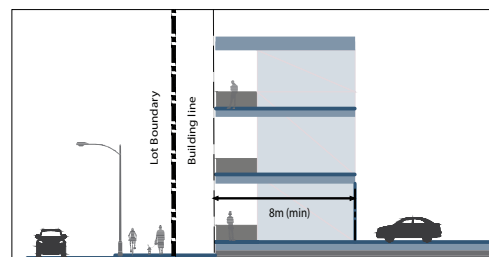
At-grade open air parking, residential or non-residential ground floor use.
